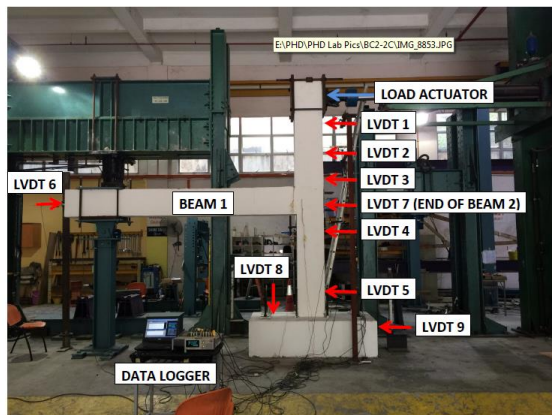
Systematic arrangement of LVDTs along the column and beams.
